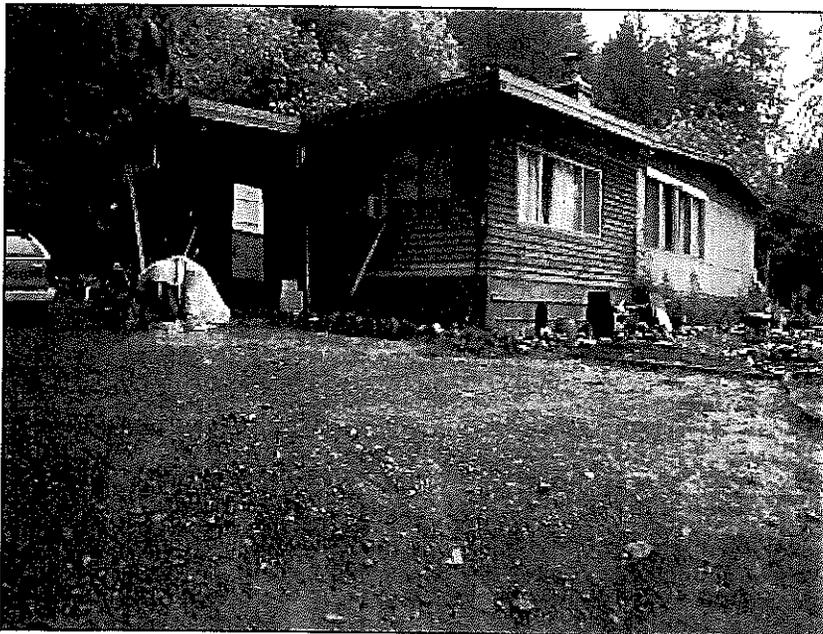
Looking east through the SPEA over the gravel parking area towards the existing house. The porch extends into the SPEA.
